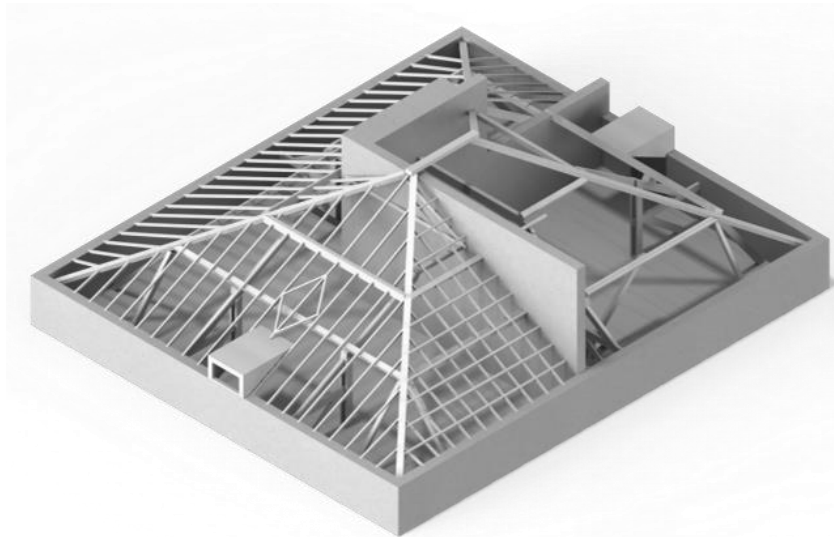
Complex solution of purlins truss [credits Alice Tavares]
